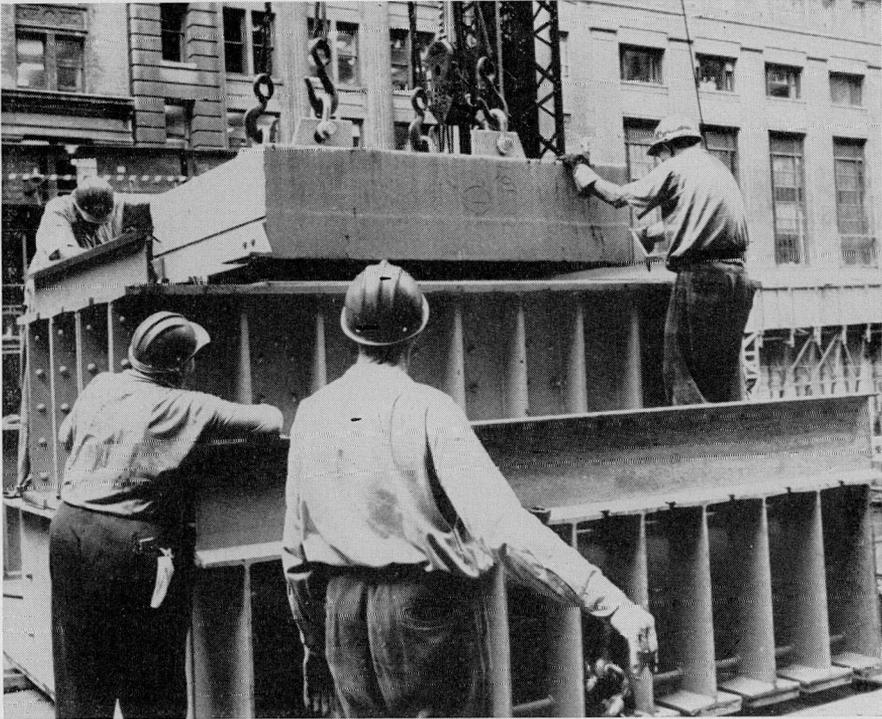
TWO TIERS OF THE GRILLAGE, AND THE BILLET, BEING ASSEMBLED PRIOR TO BEING LOWERED INTO PLACE. THE SMALLER BEAMS ON TOP OF EACH GRILLAGE TIER WERE USED TO HOLD THE INDIVIDUAL BEAMS SECURELY IN PLACE AND FLUSH DURING ASSEMBLY, SHIPPING AND ERECTION.
